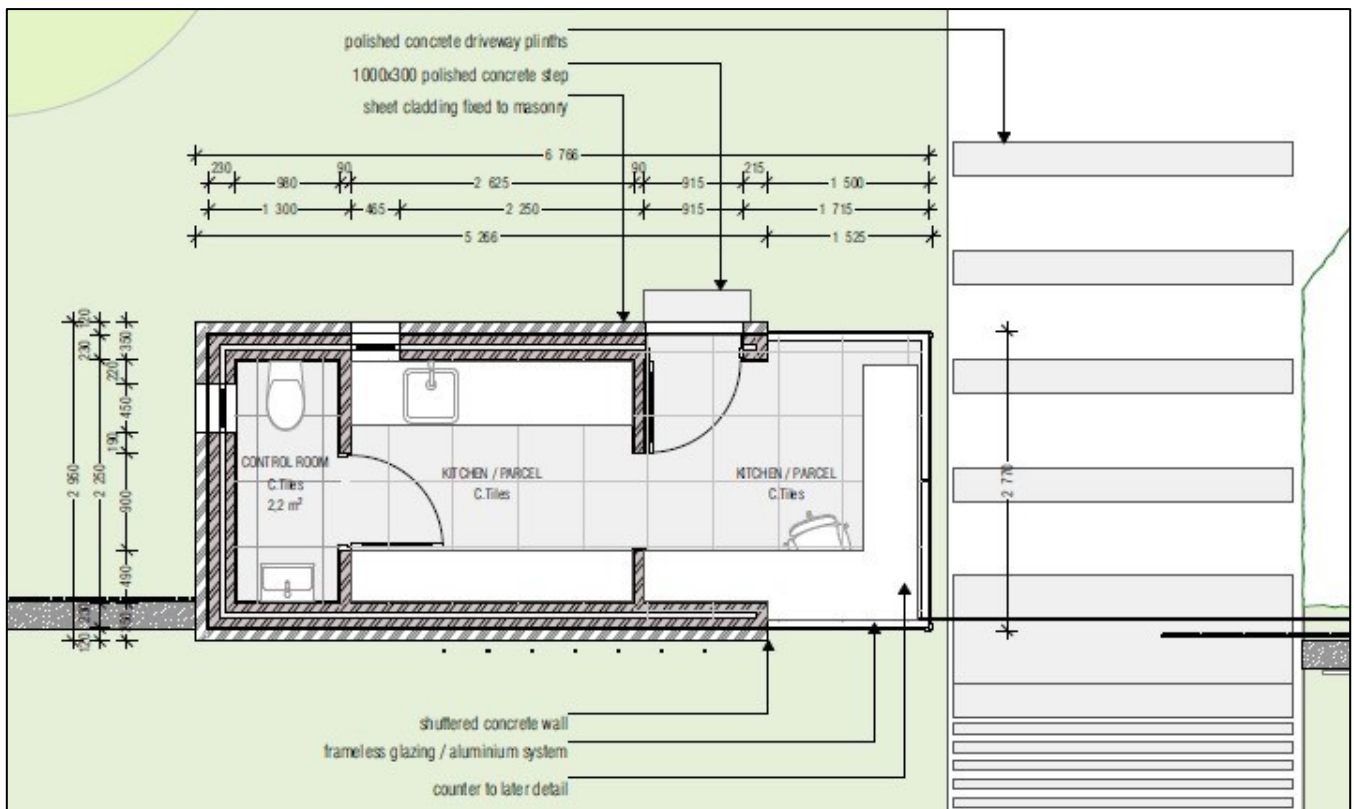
Ground Floor Plan of the Proposed Container Gatehouse Located in the South-Eastern Corner of Fable Smallholdings (Source: COA, 2021).
